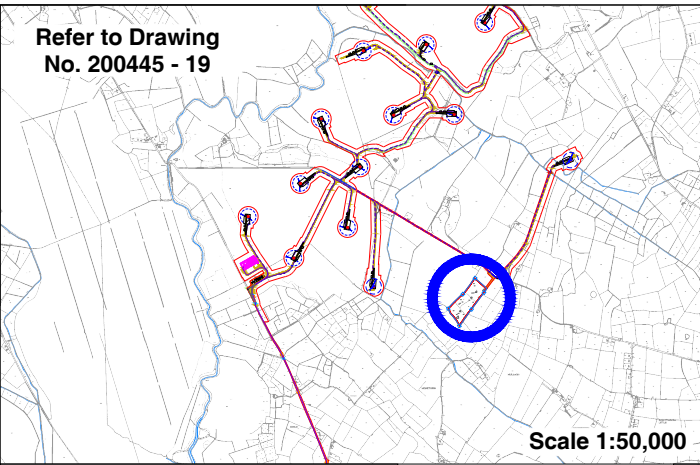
BORROW PIT NO 1 - PLAN AND CROSS SECTION DETAILS
